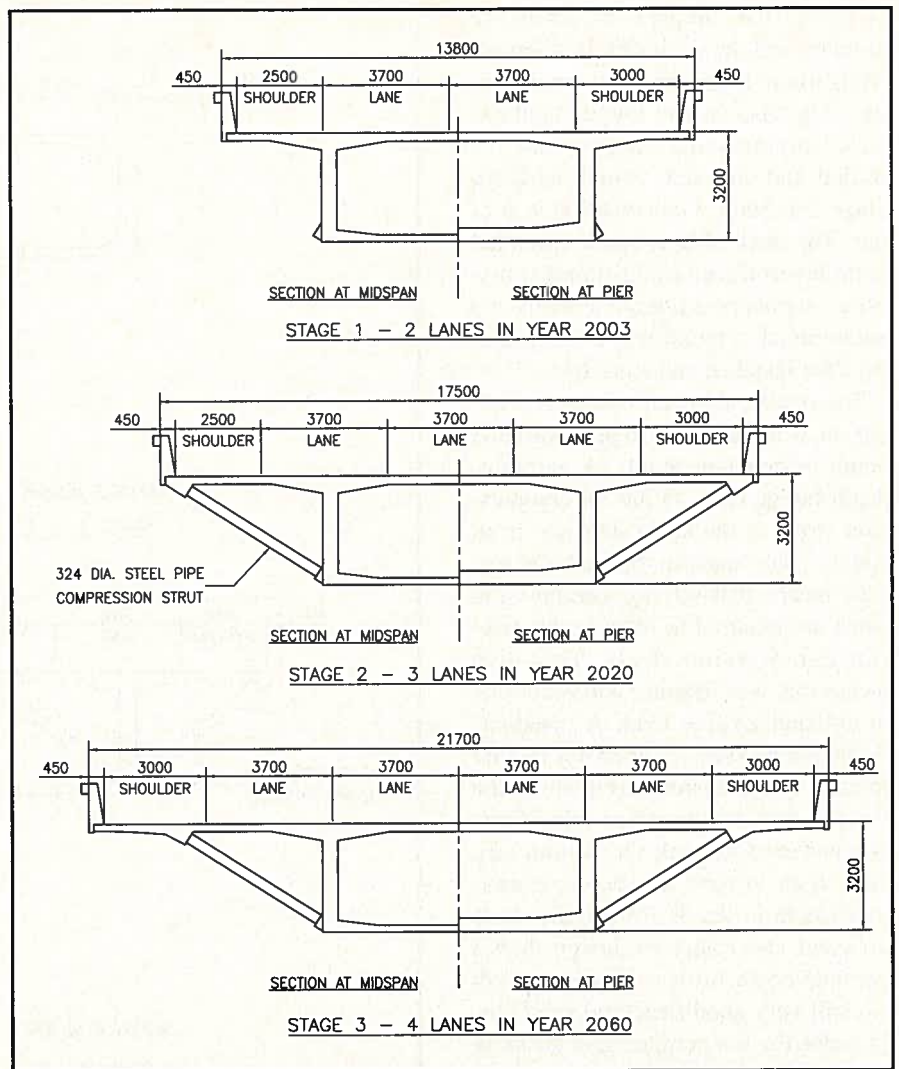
Cross section widening for constant-depth bridge (Example 2).
